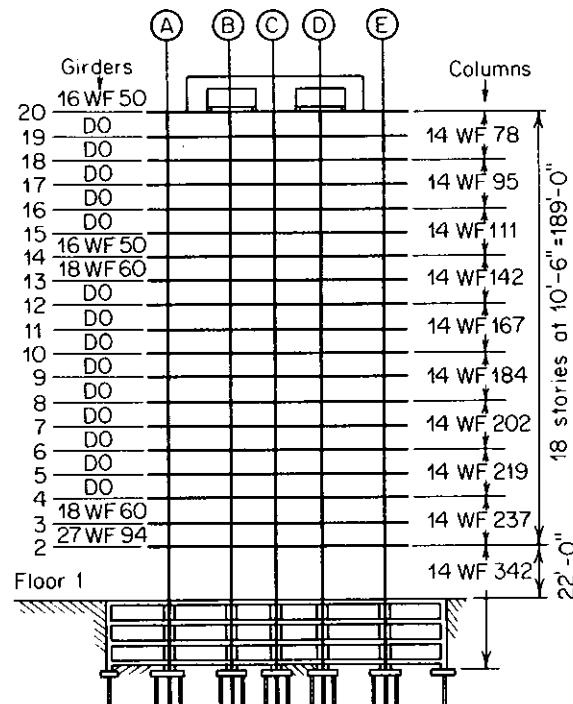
Schematic elevation showing column and girder sections of a multi-story framed structure.
